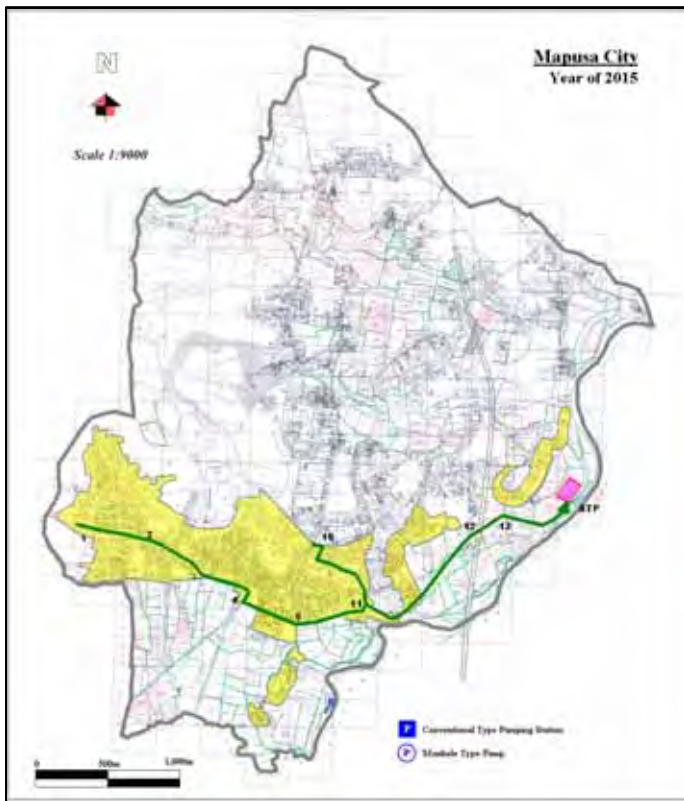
General Layout Plan of Mapusa Sewerage System
